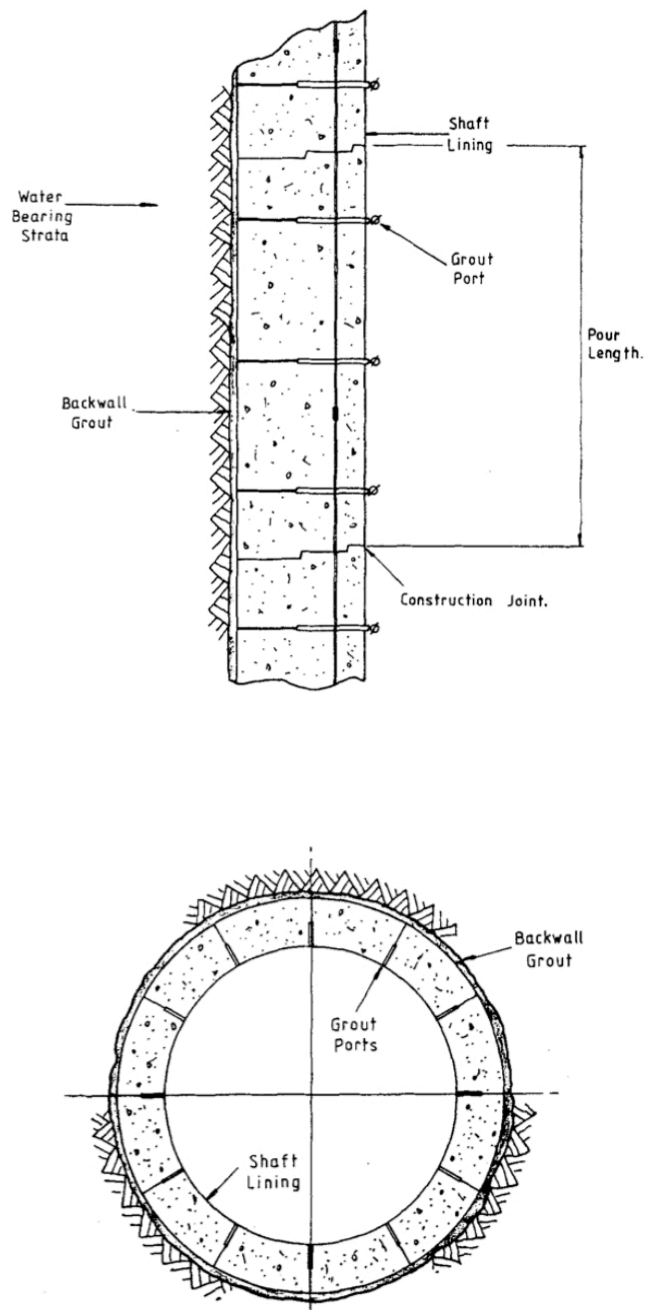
Backwall Grouting (Daw and Pollard, 1986).
